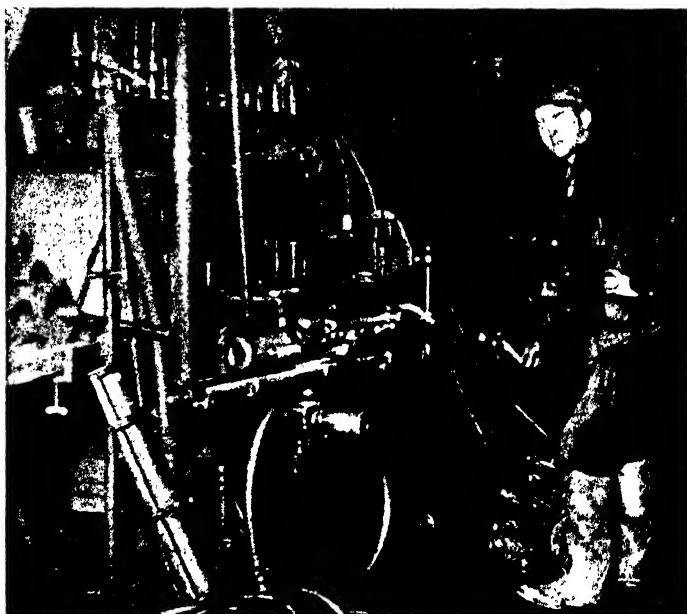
An underground drill repair shop. The "drill doctor" is an indispensable mechanic on every tunnel job.
